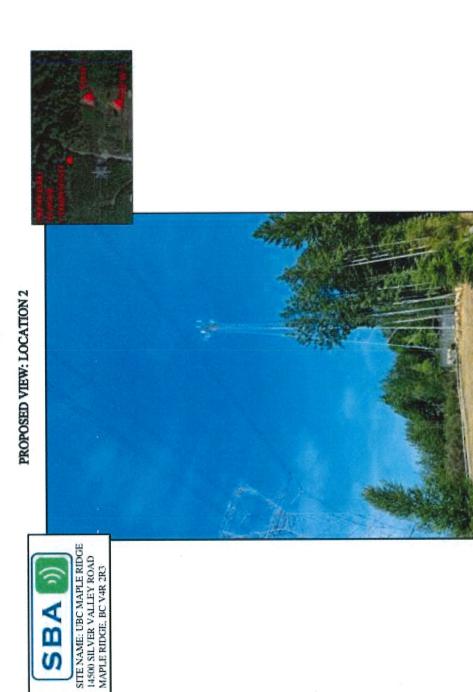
PHOTO RENDERING BY TOWER ENGINEERING PROFESSIONALS, INC.
